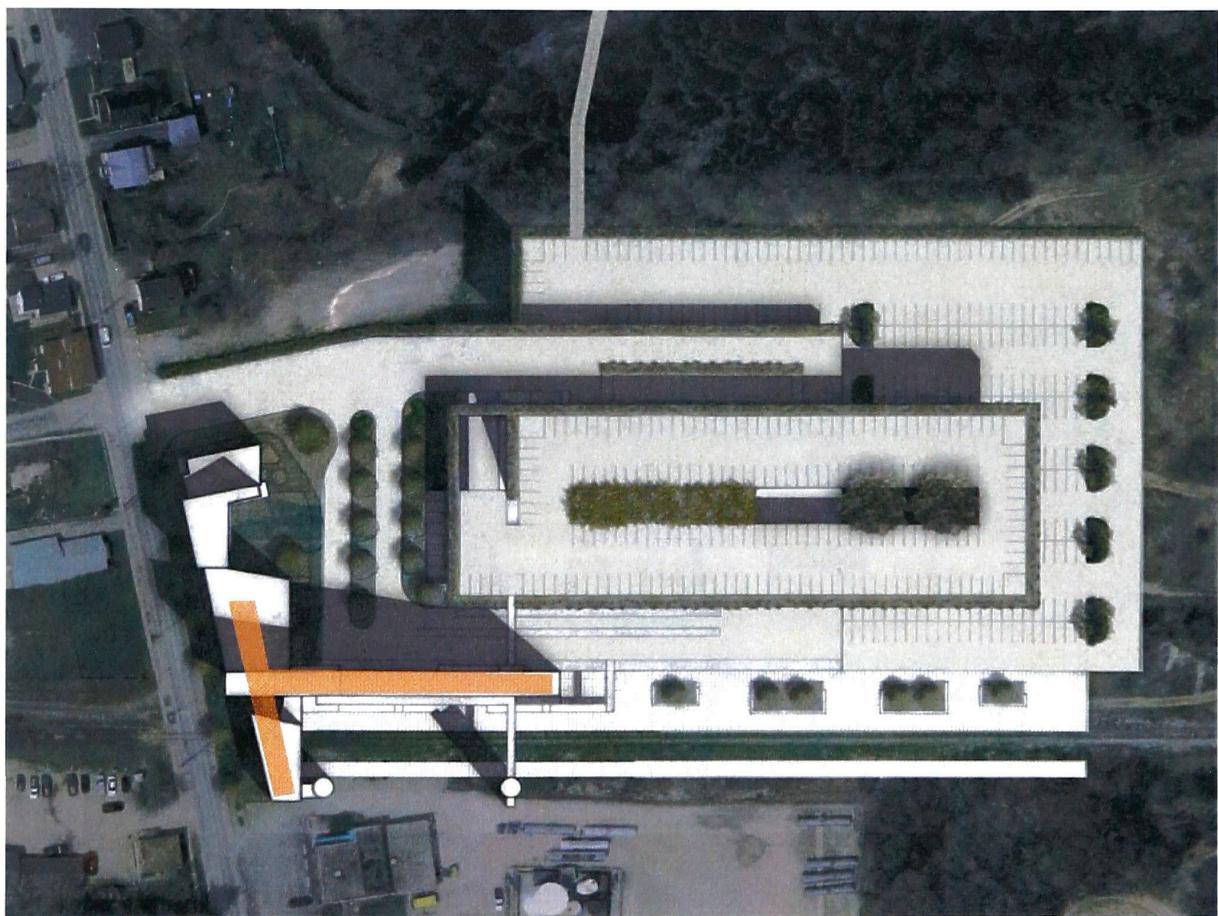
Site Plan Highlighting the ‘T’ Shape Design
